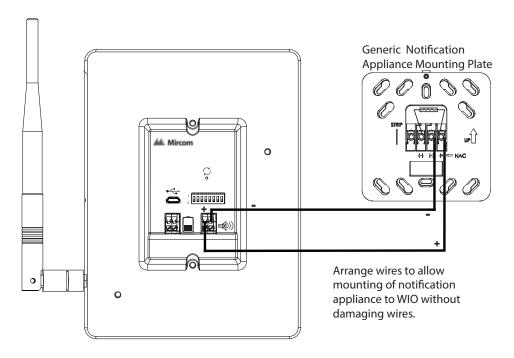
Wiring the Notification Appliance Mounting Plate to WIO unit
